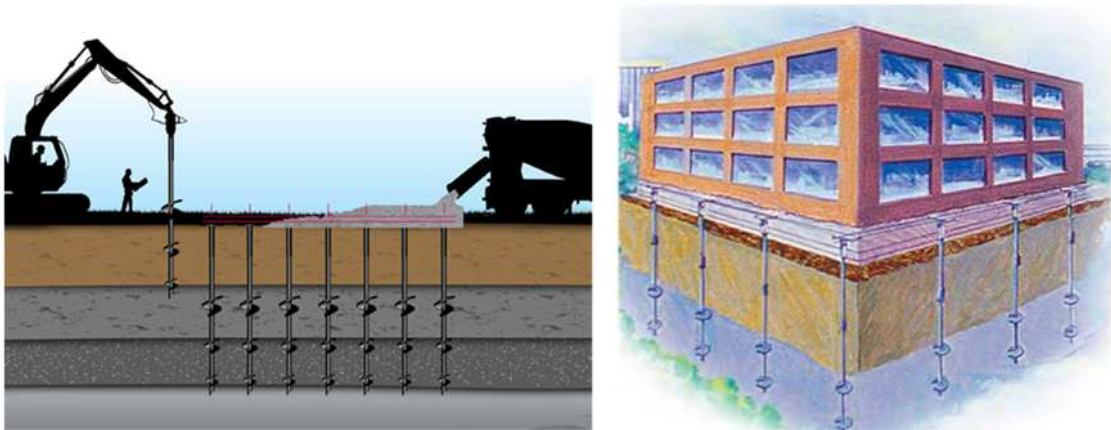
1 Using helical pile in the new construction foundations (Perko, H. A. , 2009)
